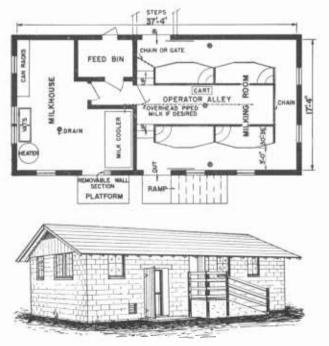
An efficient arrangement of four elevated, sideentering stalls for piped or hand-earried milk.
